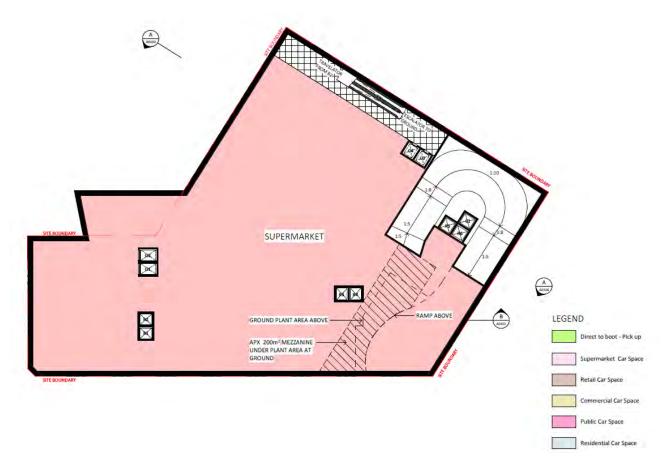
Proposed floorplan concept for the lower-ground supermarket
